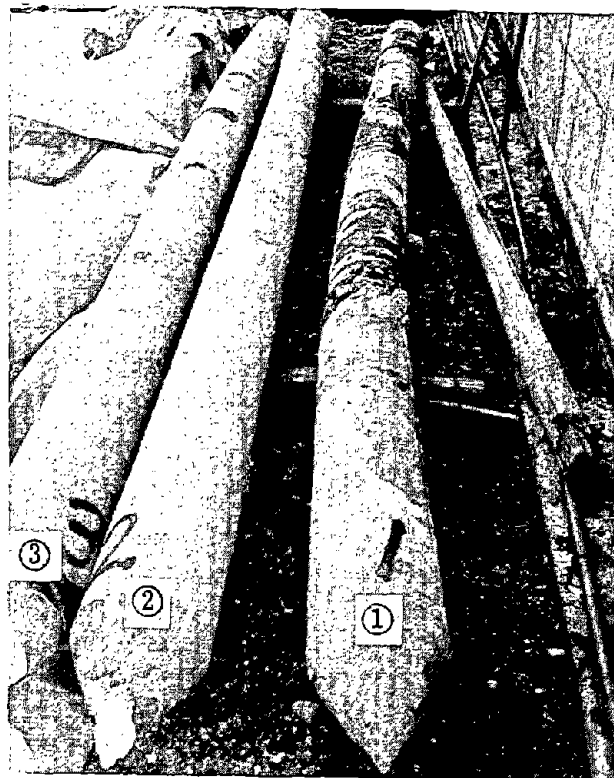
Damage to the Foundation Piles of S-Building¹¹⁾
